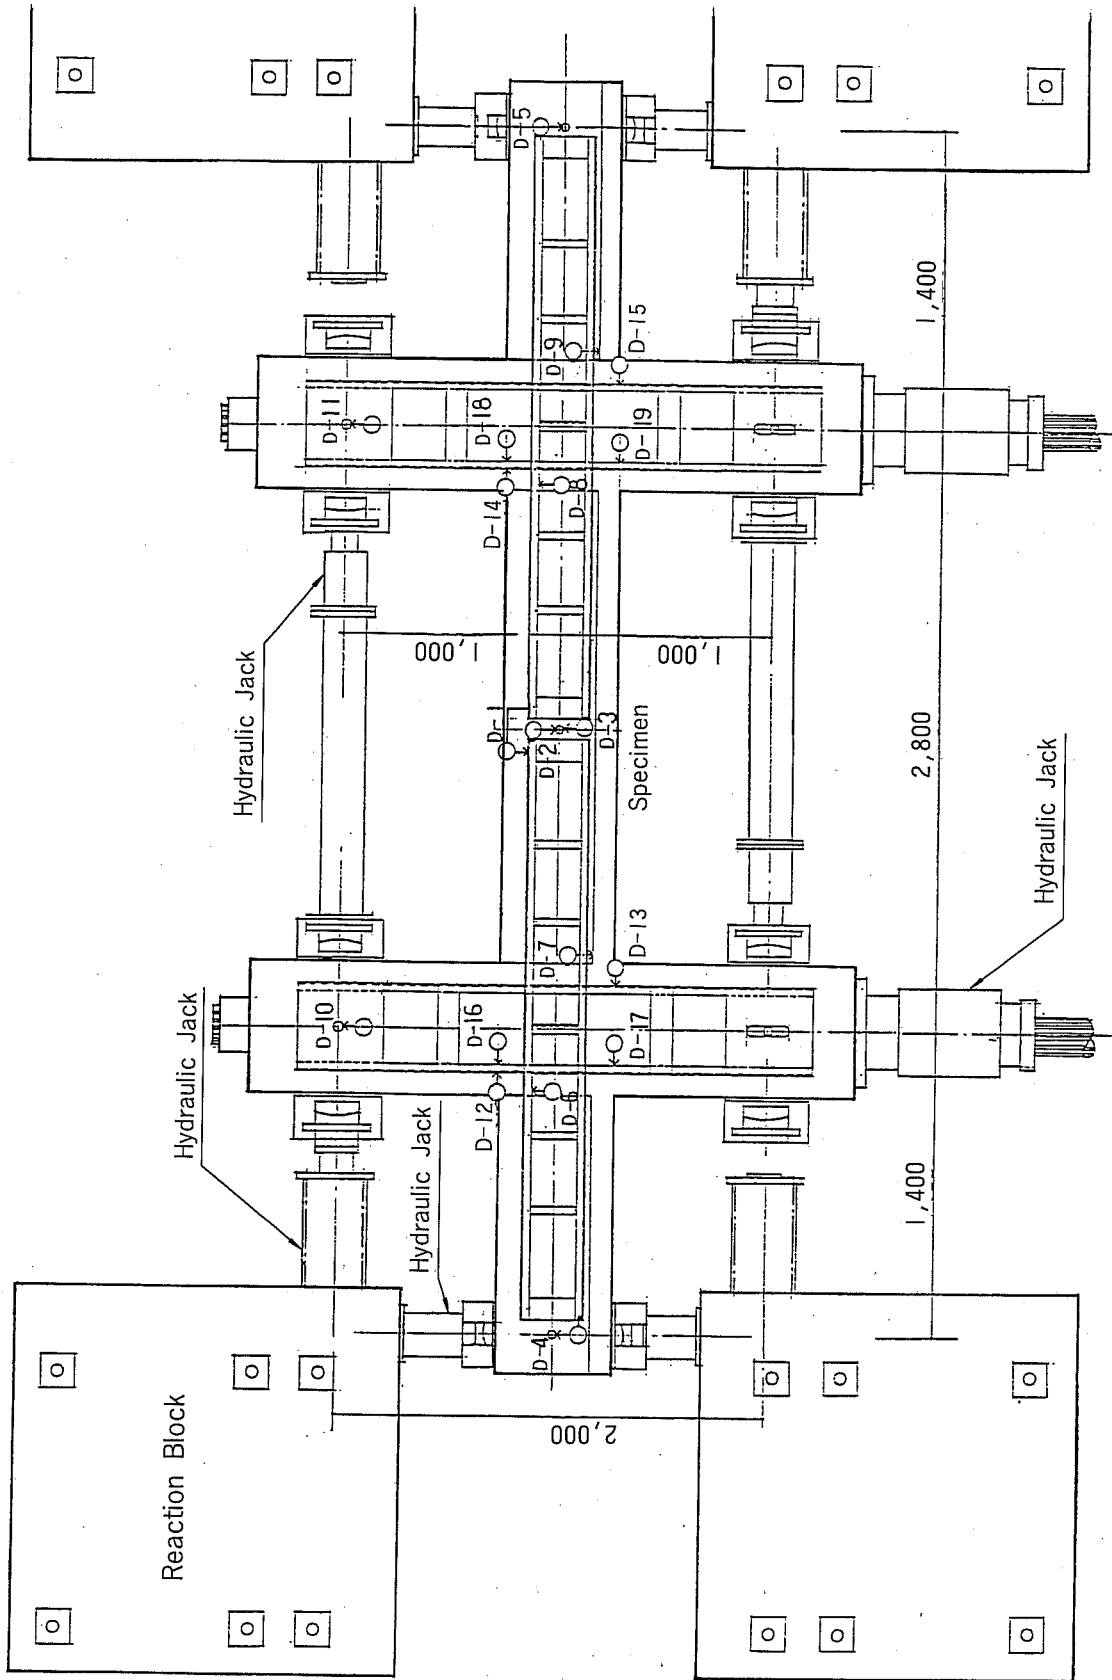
Loading Set-Up for Beam-Column Subassemblage
